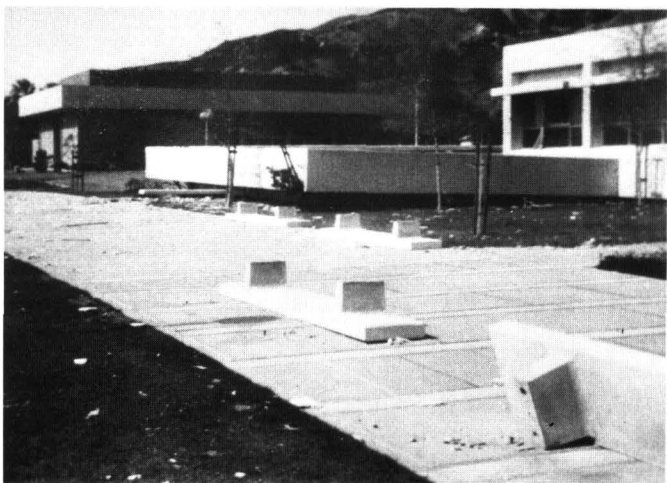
Olive View Hospital. Overturned concrete benches. Psychiatric Unit in background.
